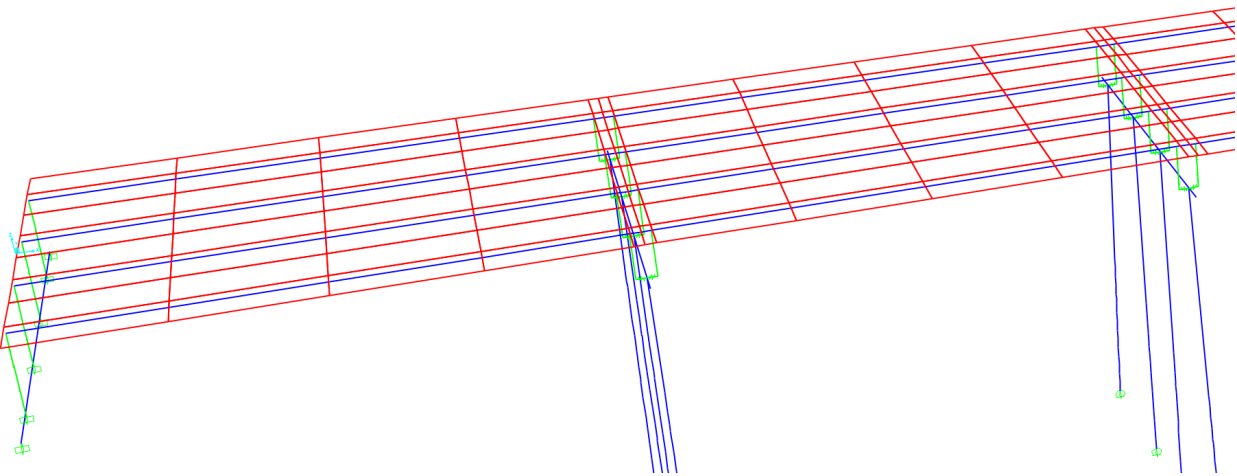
Bridge Modeler Shell Element Discretization for Interior and Exterior Spans
